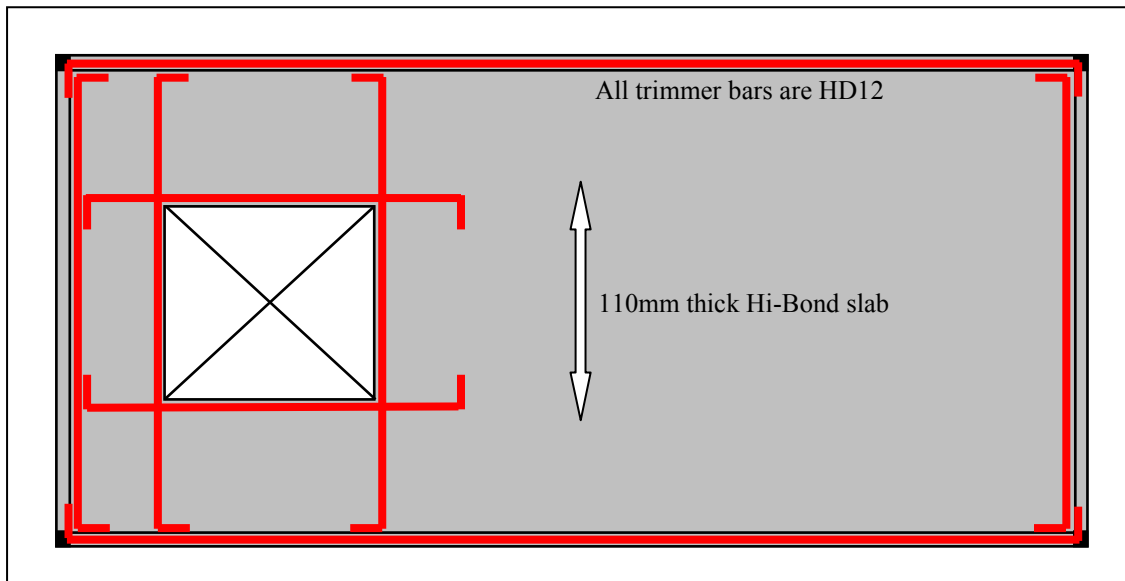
Trimmer reinforcing bar details after strut-and-tie method
